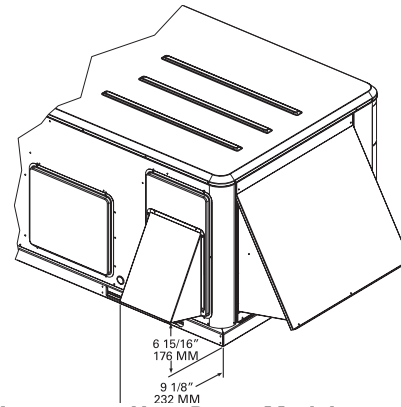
Heat Pump Models - 3-4 Tons - R-410A Barometric Relief Damper Hood
